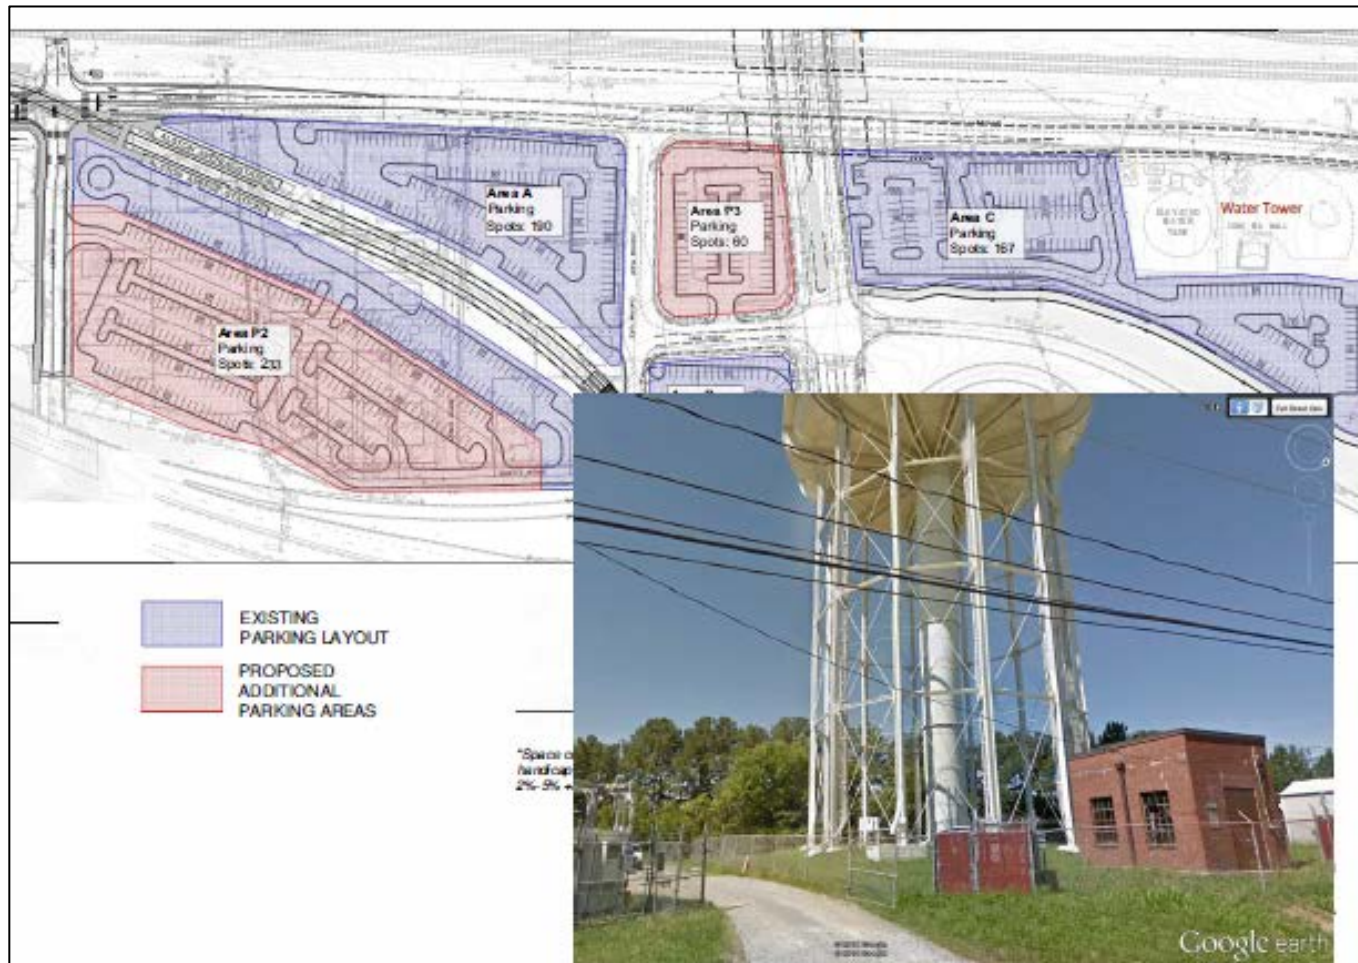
Proposed project plans in area of Durham Water Tower and Valve House
